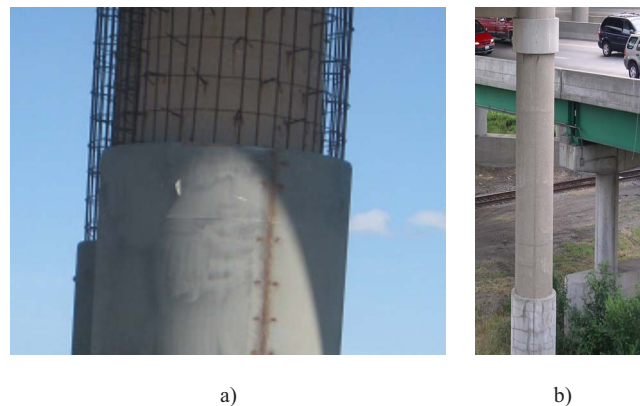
(a) Concrete column overlay under construction in Tennessee (Hernando DeSoto Bridge I-40); (b) a partial height concrete encasement of a column in Illinois (Poplar Street Complex)
